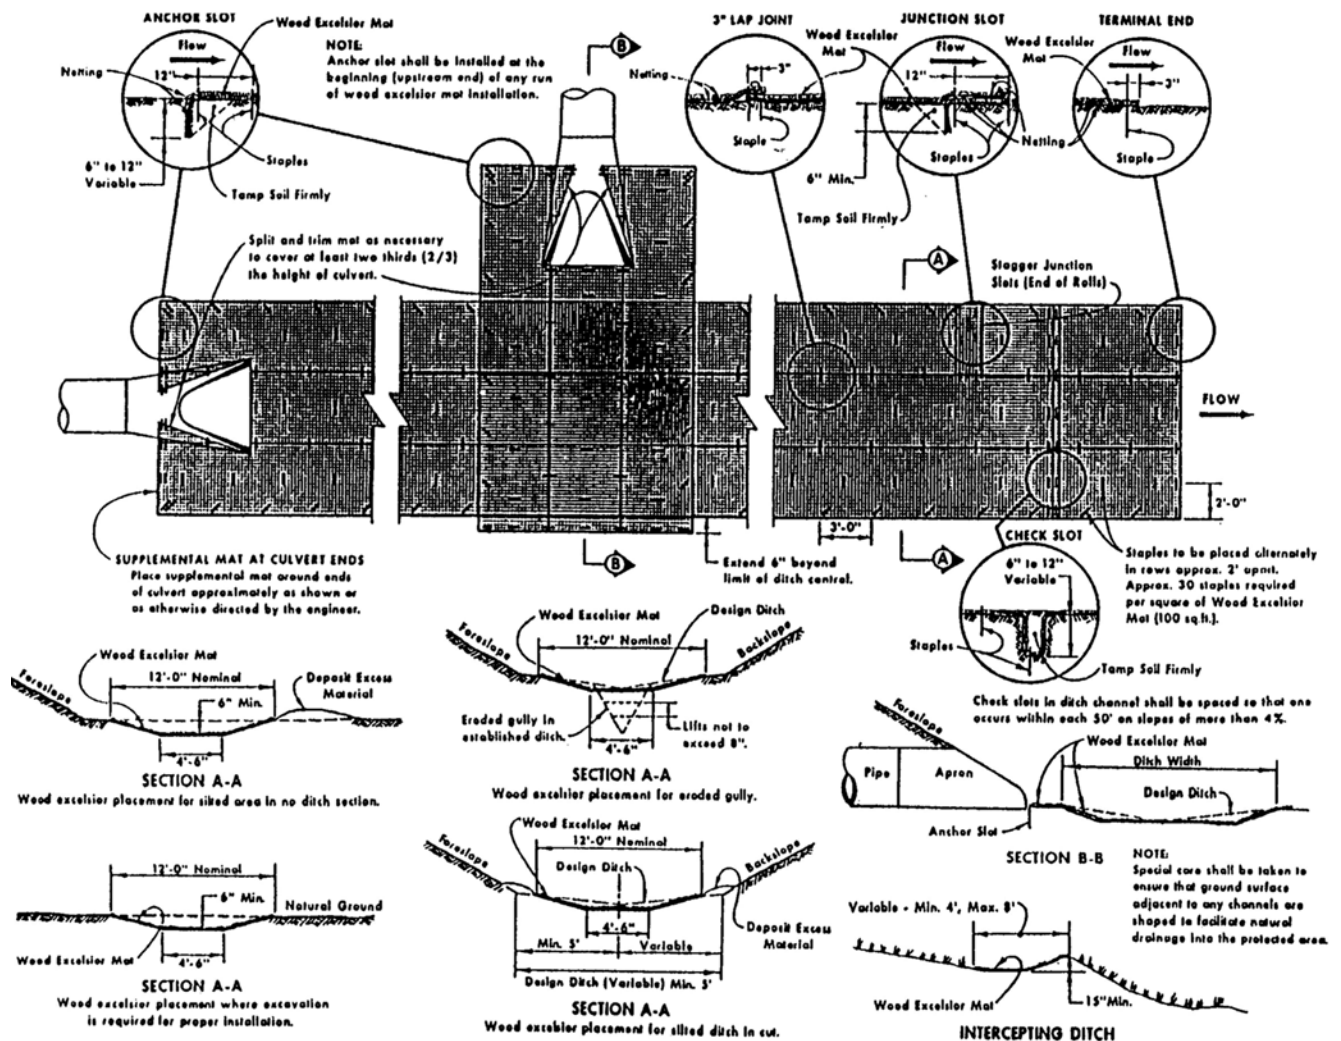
Special ditch control (Source: Department of Civil, Construction, and Environmental Engineering, Iowa State University)
